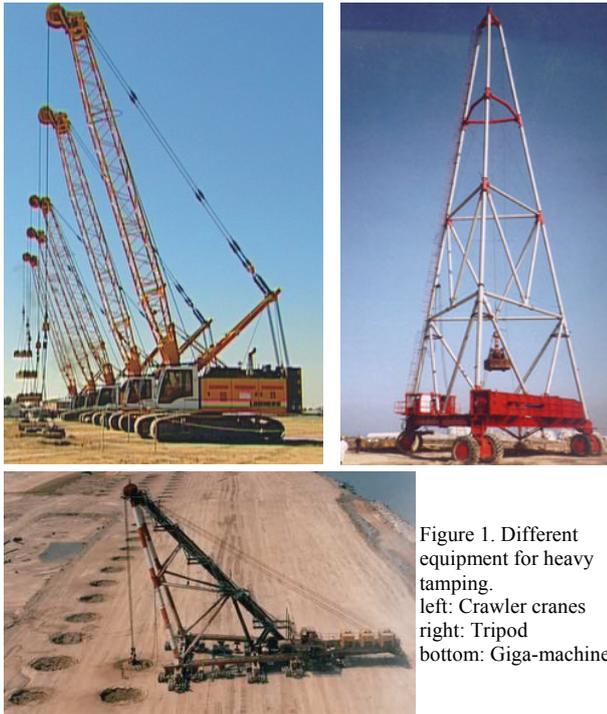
Different equipment for heavy tamping. left: Crawler cranes right: Tripod bottom: Giga-machine
